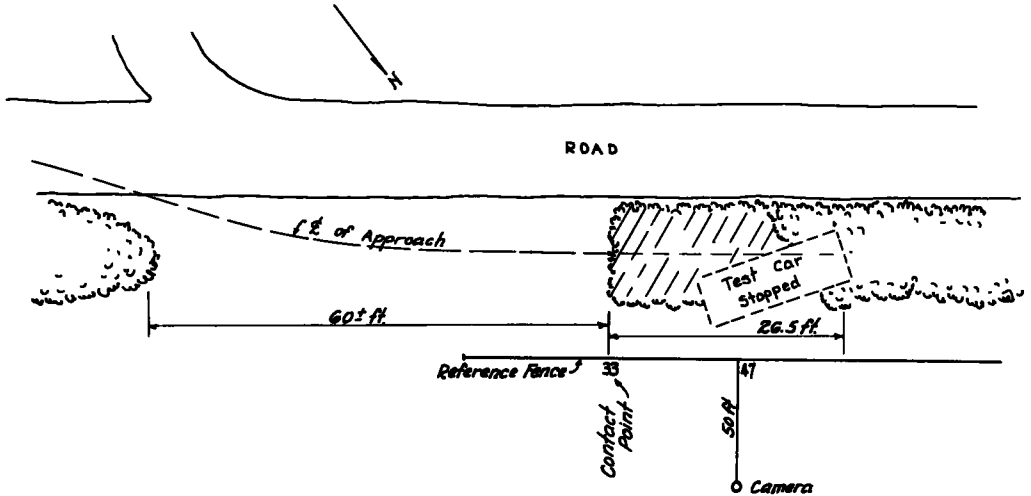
Plan of the site, sketch of head-on test (Test No. 1—30.3 mph contact speed).
